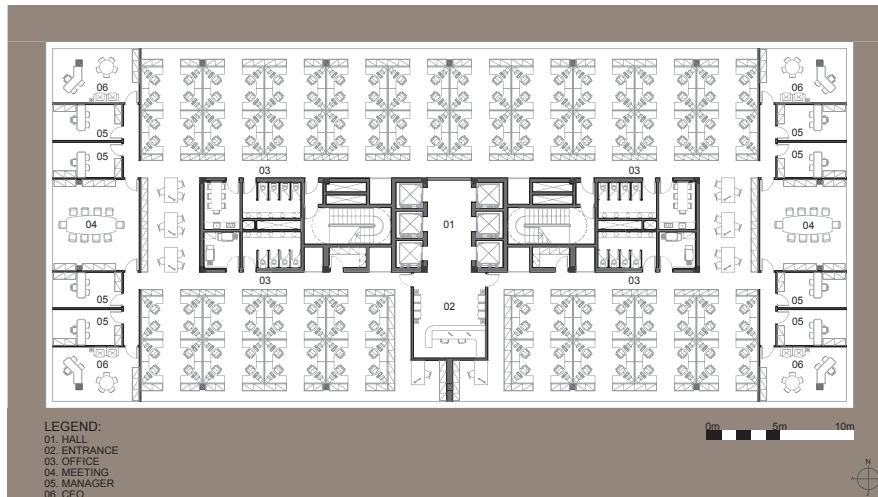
Plan of the proposal of closed office for 1 tenant per floor. Scale 1/500.
